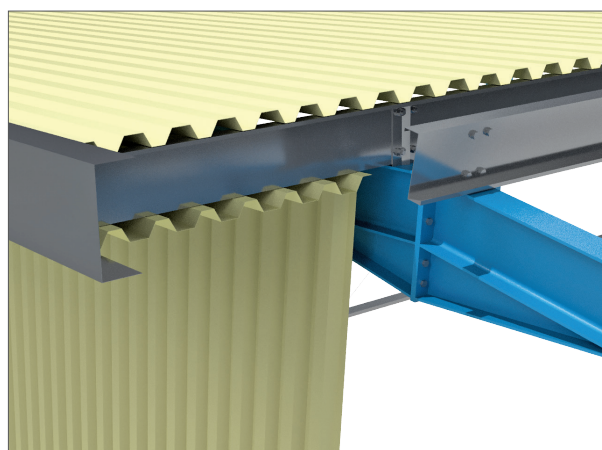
Cantilever bracing with L sections and a WDT tie
